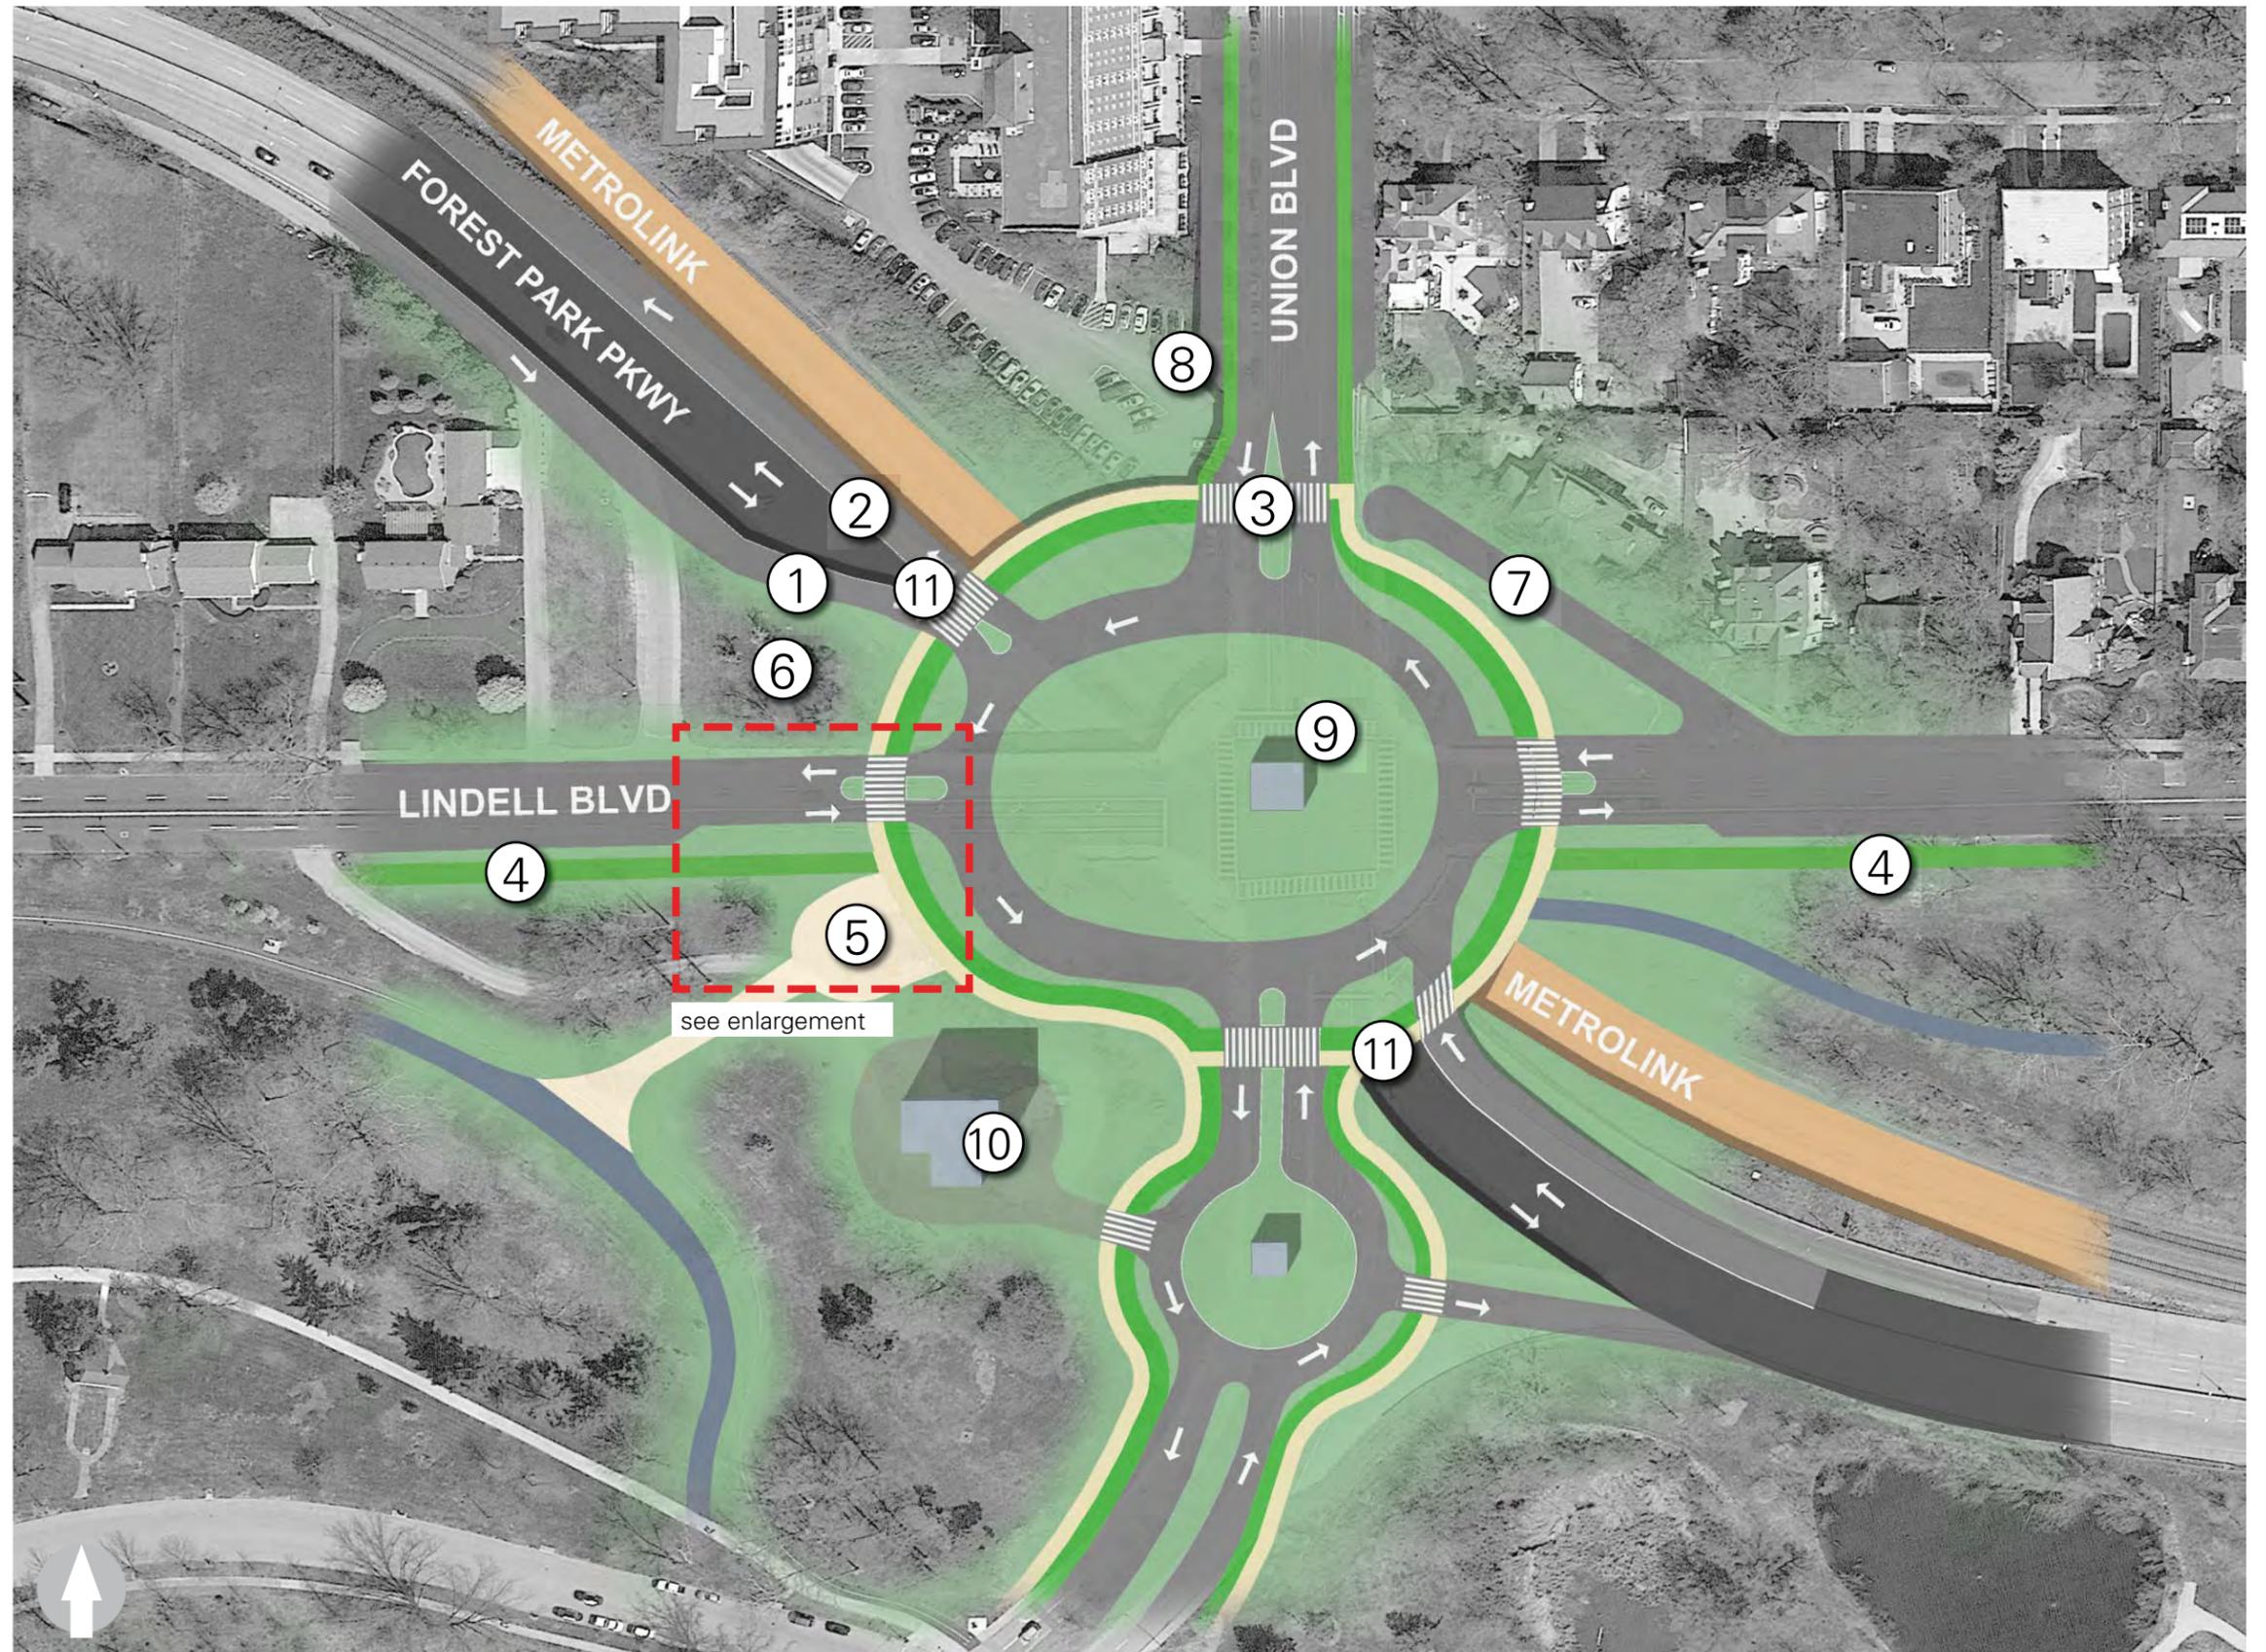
Proposed new entry at Union Boulevard and Lindell Boulevard
